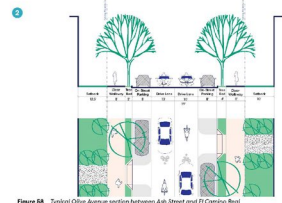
Typical Olive Avenue section between Ash Street and El Camino Real
